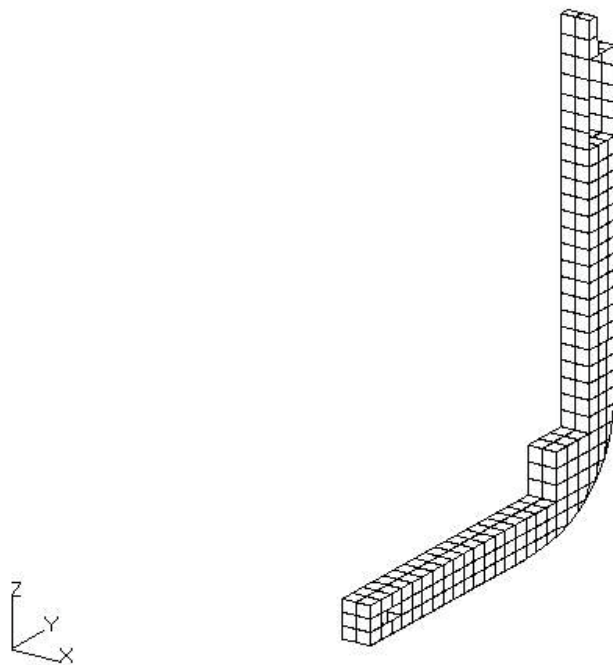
(1) Typical Finite Element Transverse Model with Cutoff
